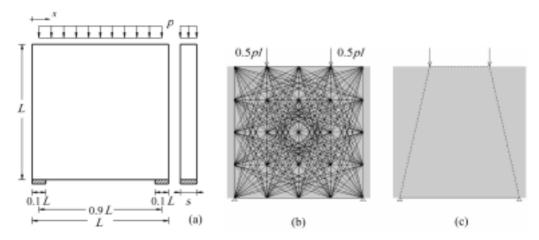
Structural element (deep beam): (a) geometry and boundary conditions; (b) basic truss; (c) maximum stiffness-minimum volume truss
